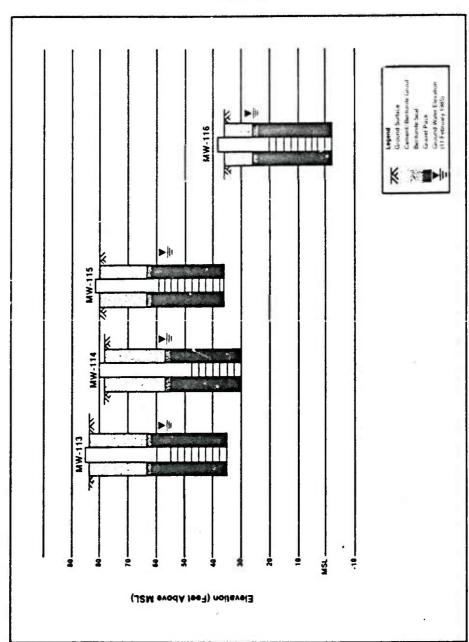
WELL CONSTRUCTION SUMMARY, LANDFILL NO. 3 AND JP-4 SPILL SITE
